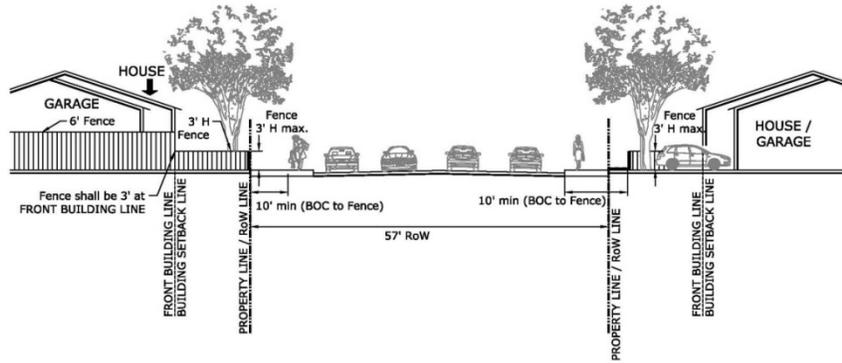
(d) – Typical Cross Section with NO Landscaped Area and Sidewalk
